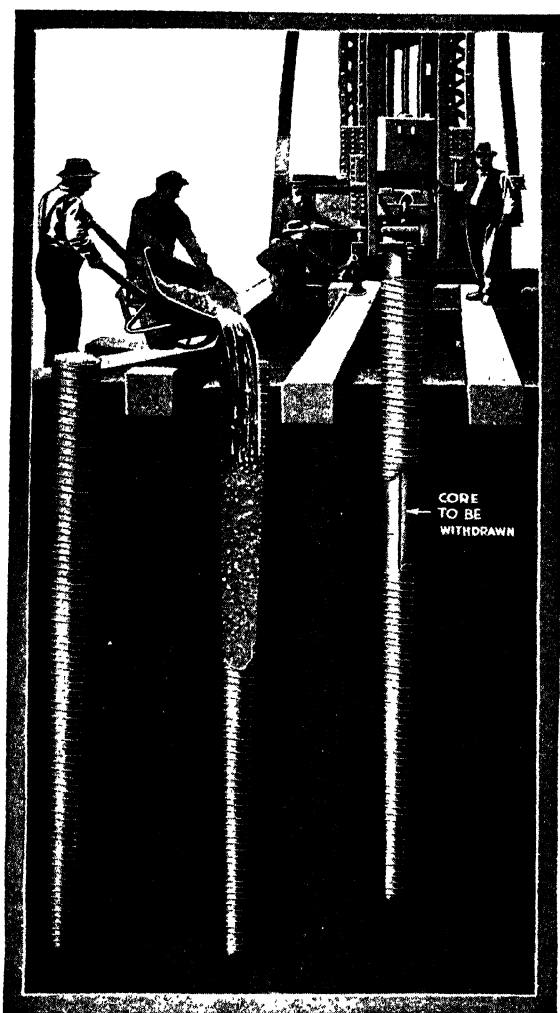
Method of Forming Concrete Piles in Place. (See p. 685.)
